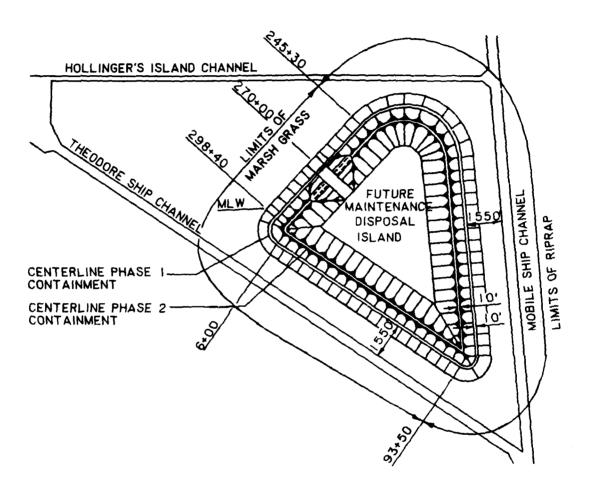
Plan view of proposed design and shoreline protection for Theodore Ship Channel Disposal Island
